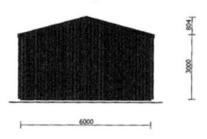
Front/Back Elevation Source: Bayside Council, 2018
